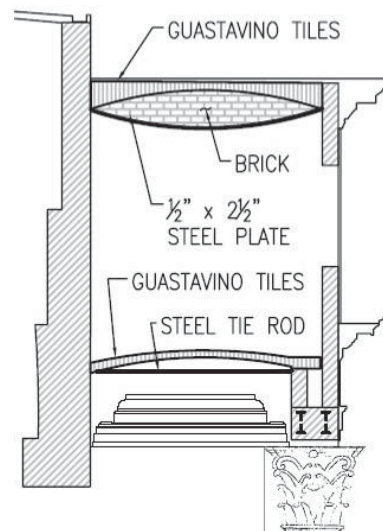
The North Portico Attic floor and roof framing consists of 2 barrel vaults.
